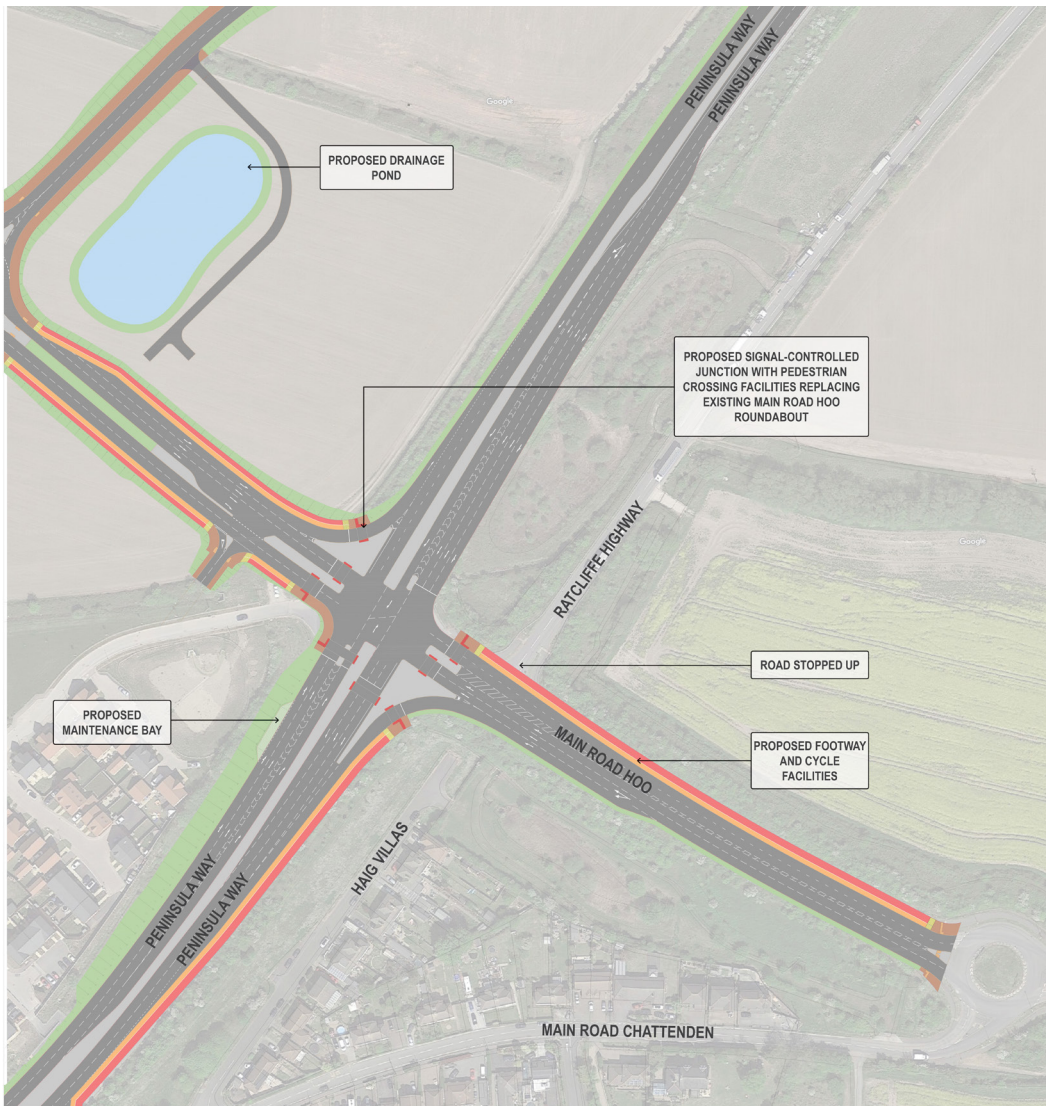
shows the proposed signal-controlled junction improvements at Main Road Hoo.
